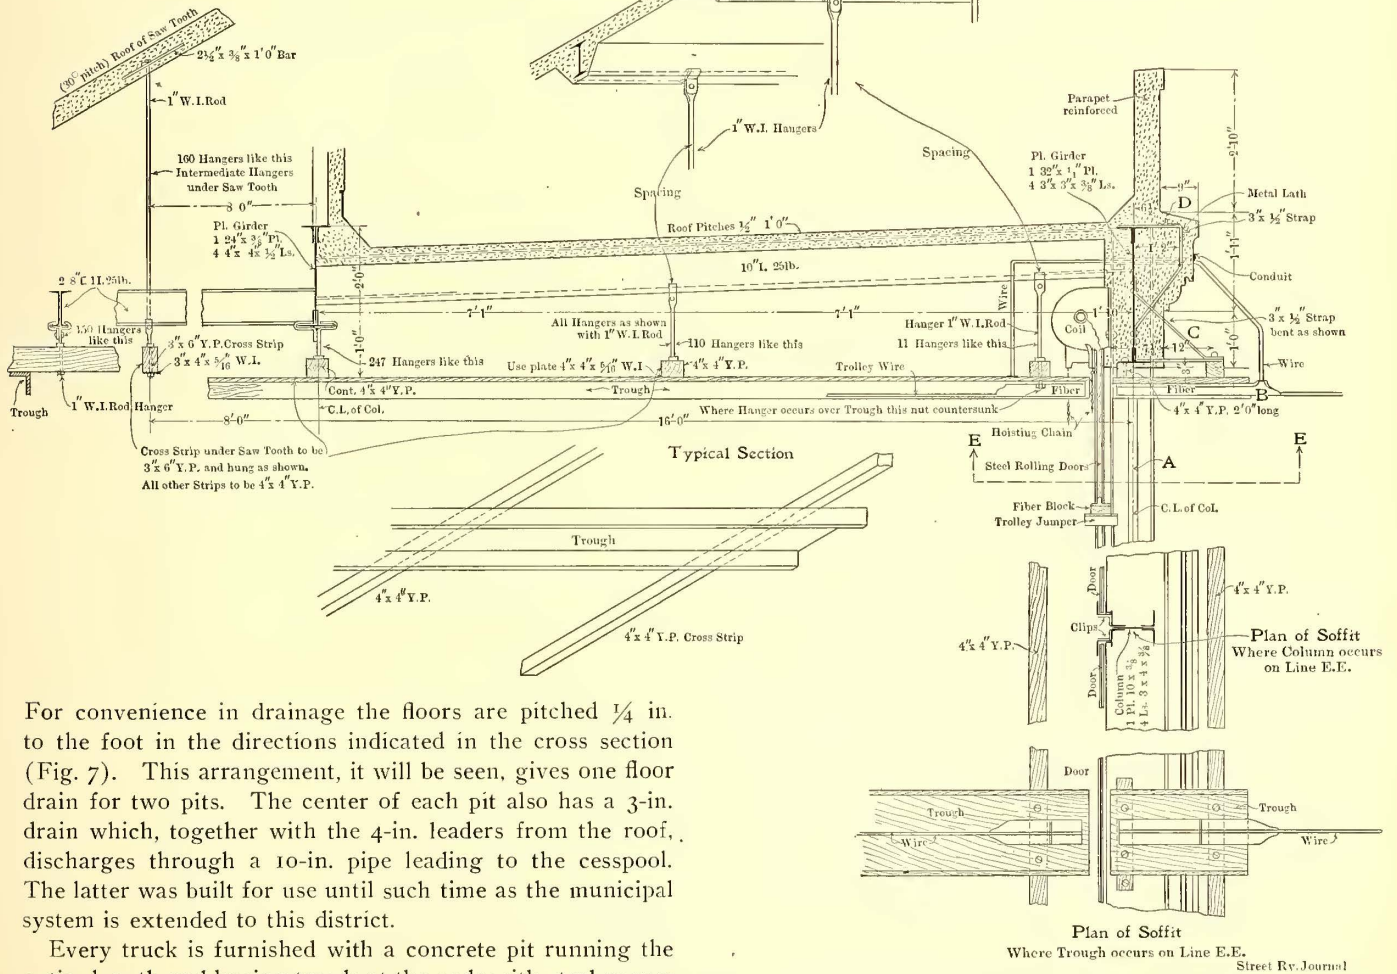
CONSTRUCTION DETAILS OF THE TROLLEY TROUGH SUSPENSION ARRANGEMENT FOR THE STEEL ROLLING DOORS
